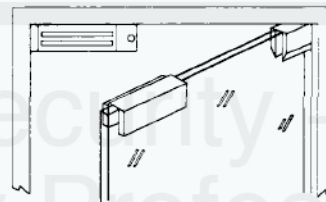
Glass door — no top rail. Armature is mounted on "saddle" bracket straddling top of door
